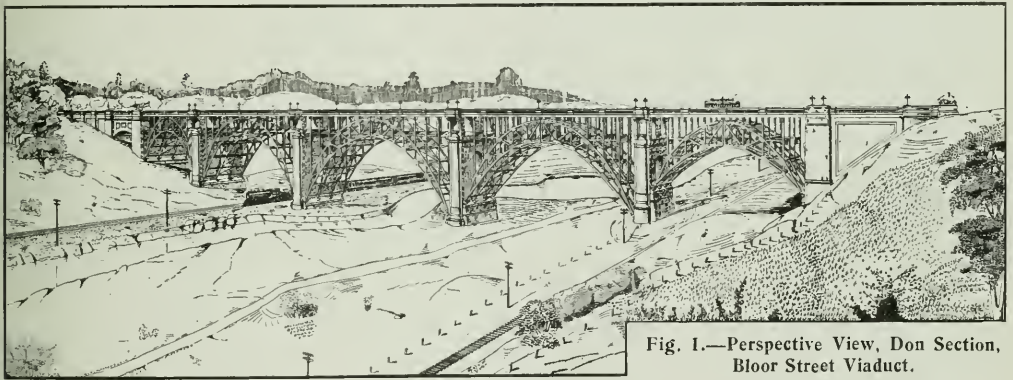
Perspective View, Don Section, Bloor Street Viaduct.
